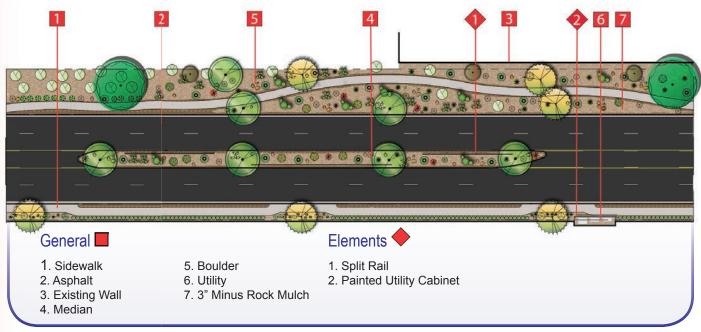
"Good" Rural Elegance Conceptual Streetscape Plan
